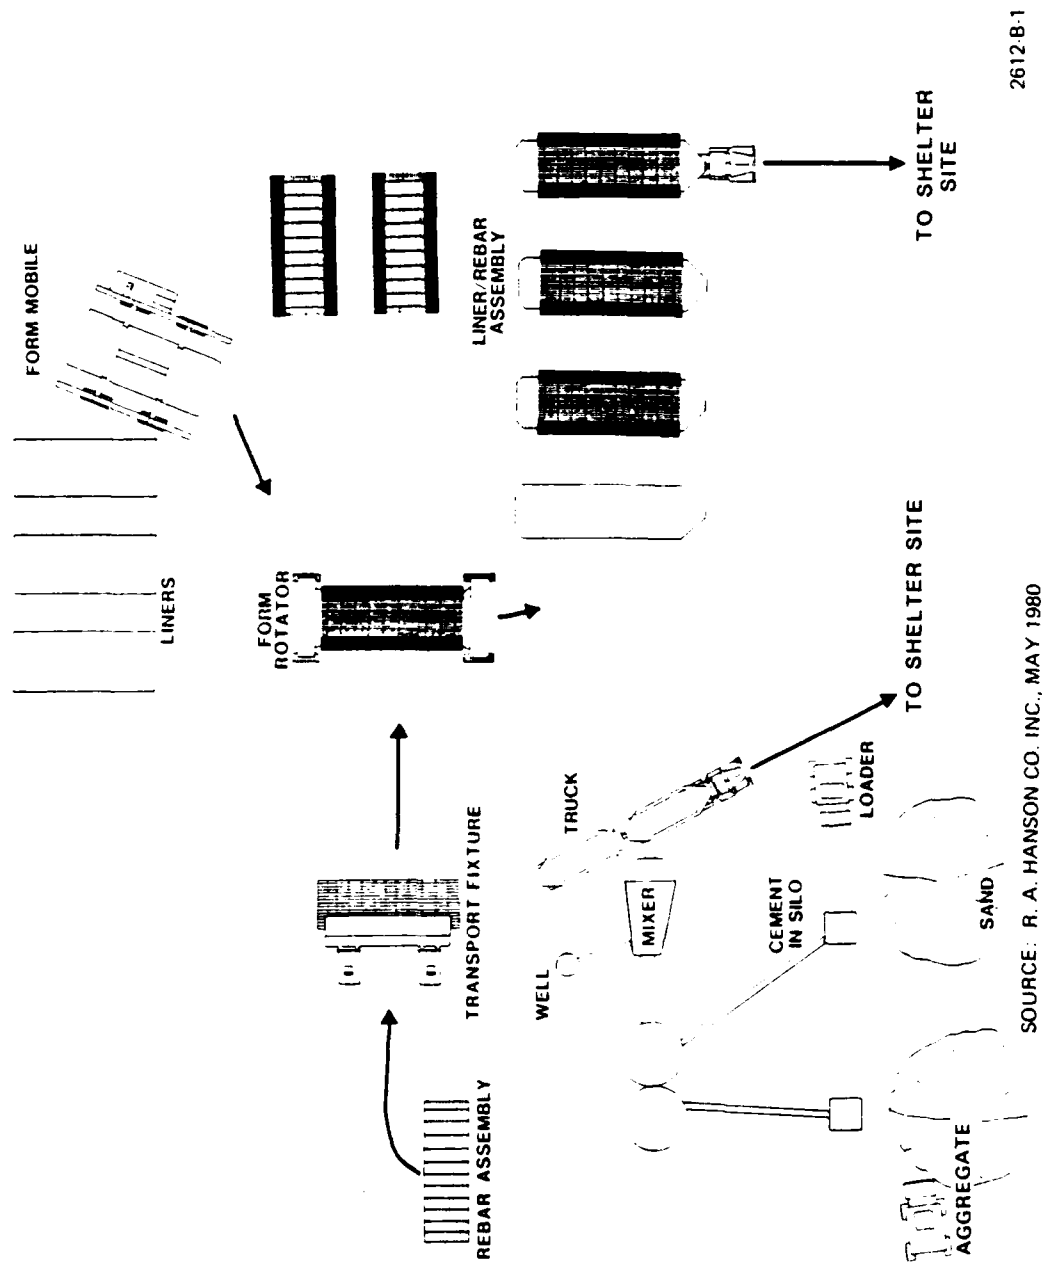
Mechanized cast-in-place concrete plant.
